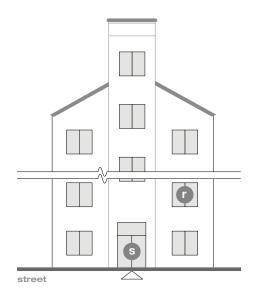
(3): Transparency and Building Entrance Requirements.
